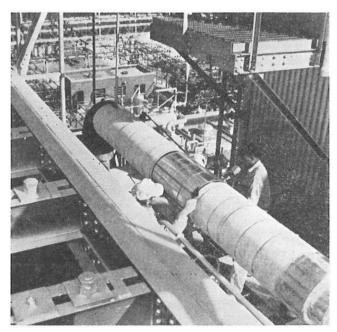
Repair to Insulation Shown in Figs. 16 and 17 by Construction of Expansion Joints and Application of New Weatherproofing
